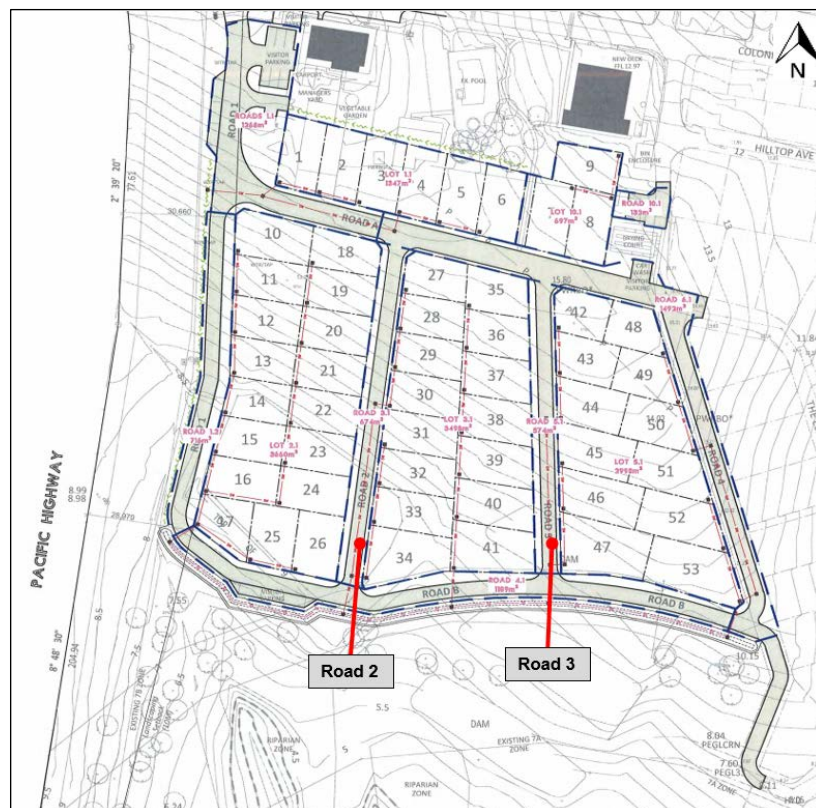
Approved site layout (base source: Approved plans for MP 08_0005)
